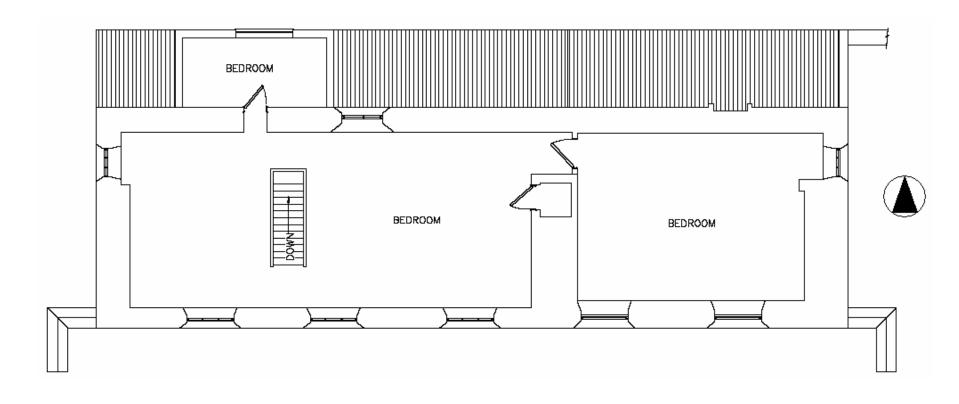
First-floor plan (Morton & Hall Consulting Ltd)
